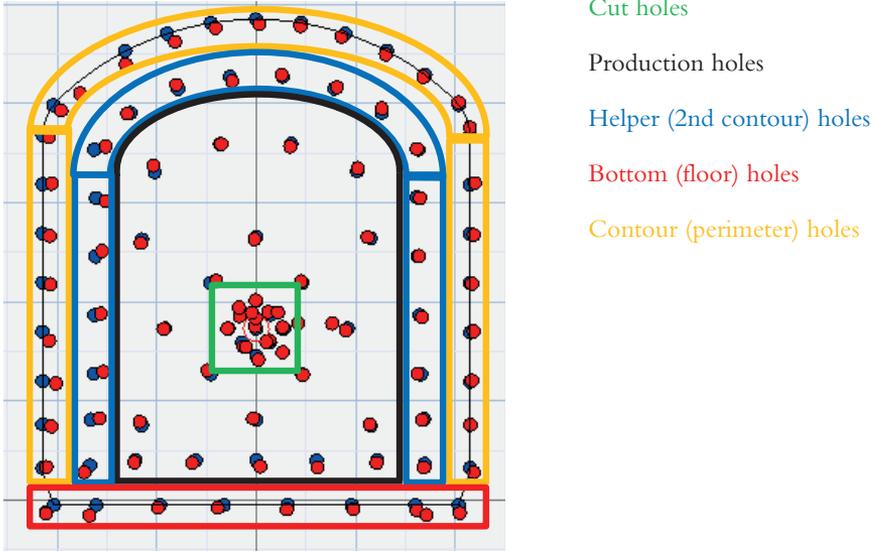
Schematic layout of a blast hole drilling round for a tunnel blast. The blue dots show the drill plan and the red dots the drilling performance.
